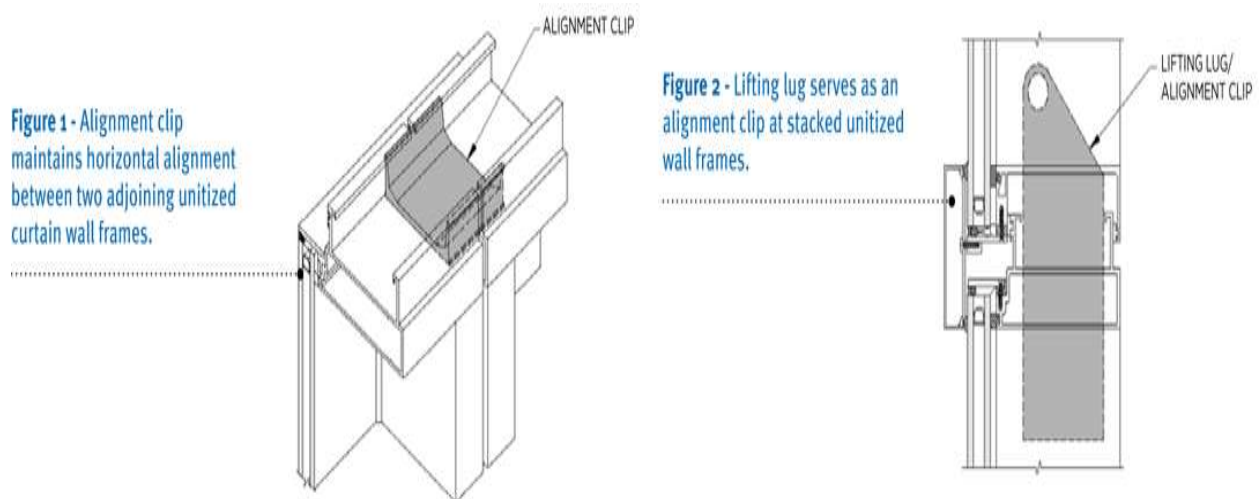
Horizontal and vertical alignment maintaining mechanism for unitized curtain wall
